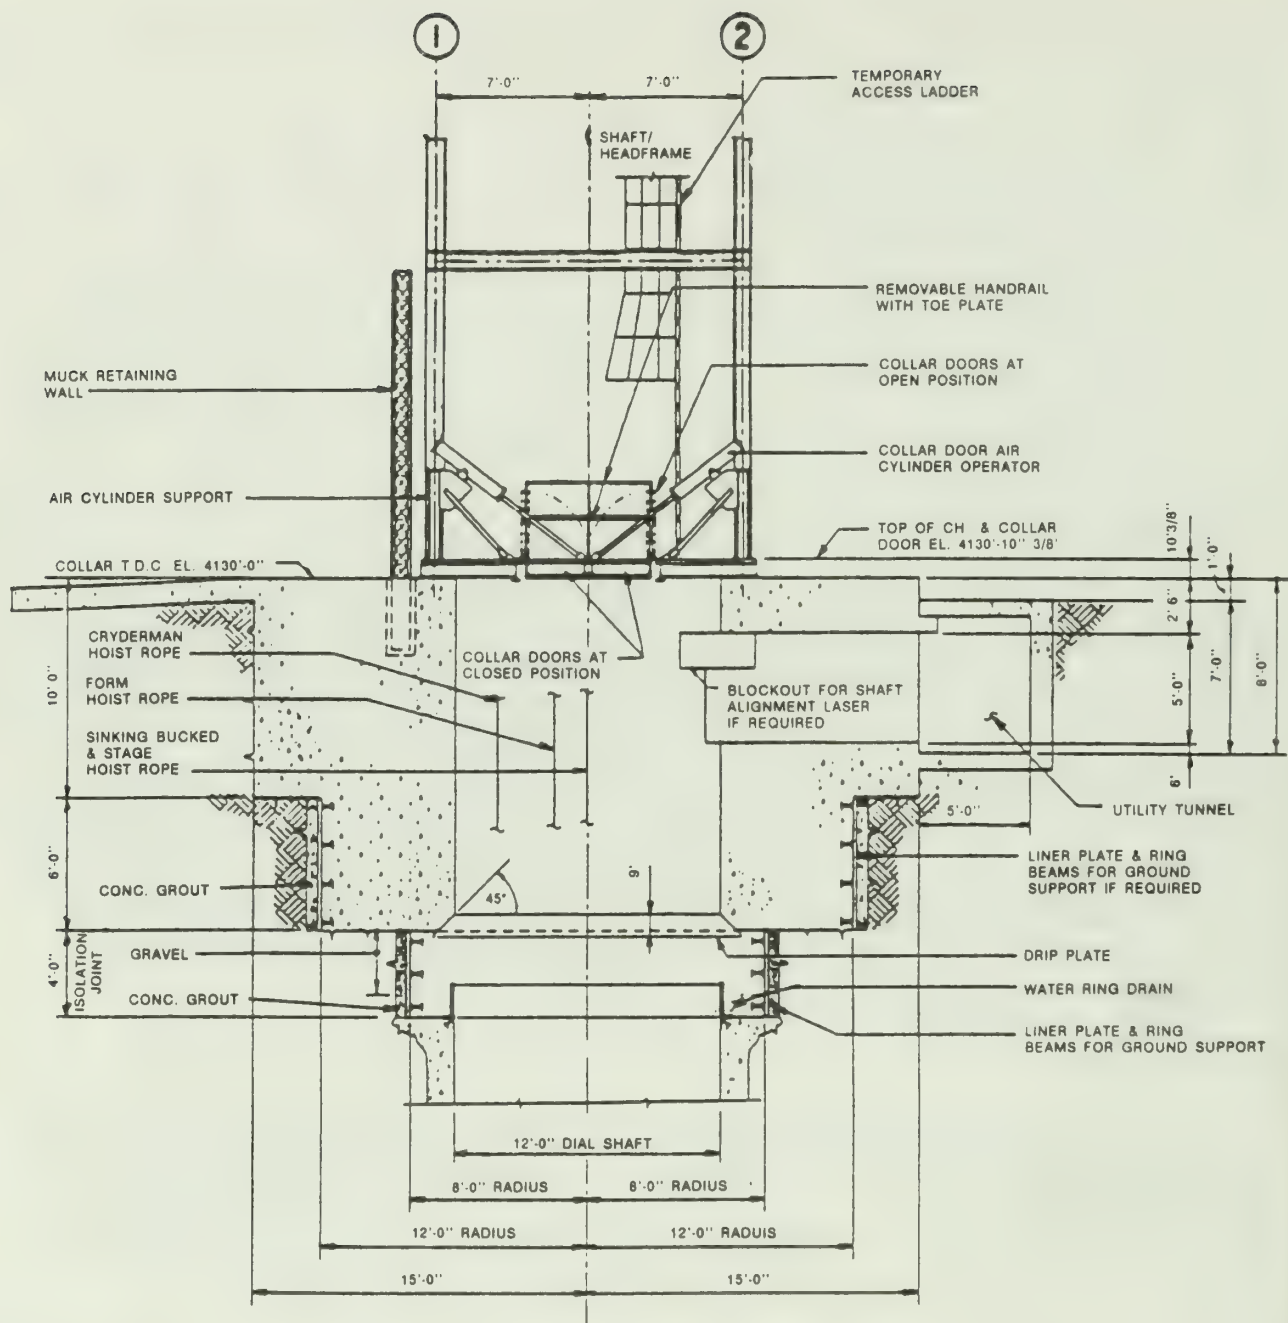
Design of shaft collar and headframe foundation. Modified from Title I design package (DOE, 1988).
